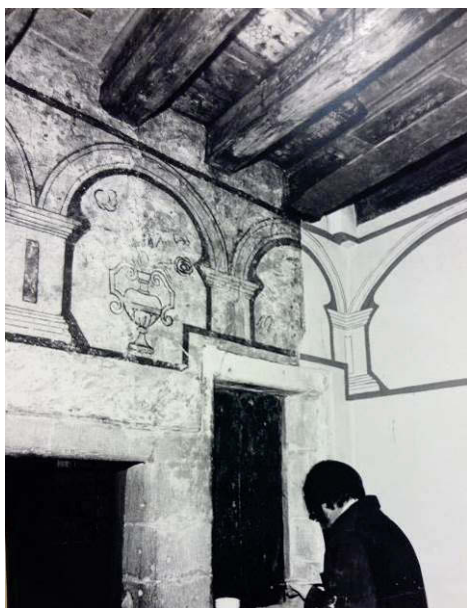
Photo showing frieze on N wall of first-floor front room, at corner with E wall. It shows the reconstructed continuation of the frieze on this wall. NTS archives P/01/053
